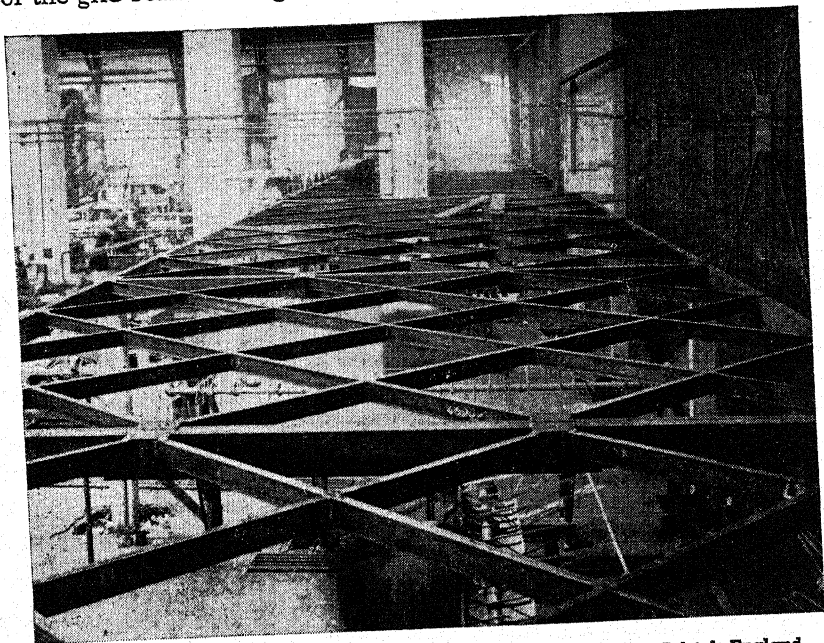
Photo of grid beam-to-edge-beam connections in factory at Bristol, England.
